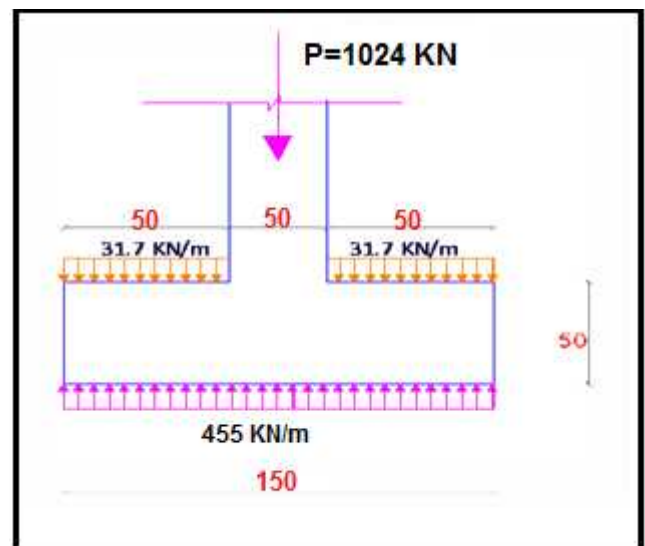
Structural system of Isolating Footing (Section A-A)
